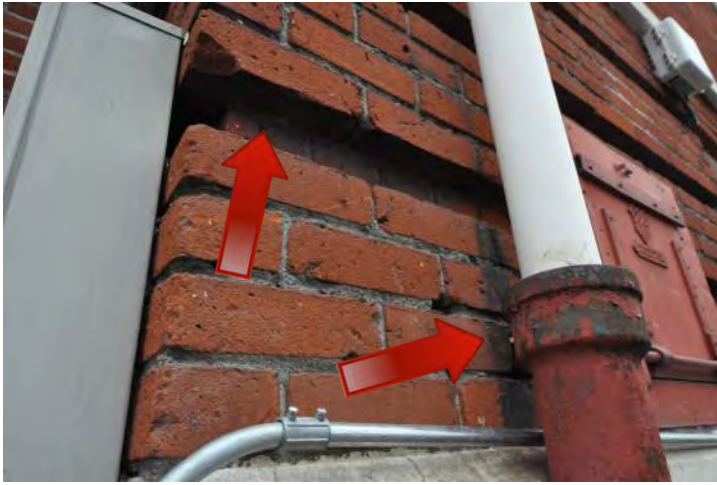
Masonry detail adjacent to the basement entry on the east elevation. Looking at the dark colored surface behind the downspout and on the underside of the brick at the recessed course indicate the color of the brick prior to the abrasive cleaning. It is unclear without additional testing whether this discoloration represents original brick color or soiling. © Richaven Architecture & Preservation, 2020. DSC\_0069.JPG.
